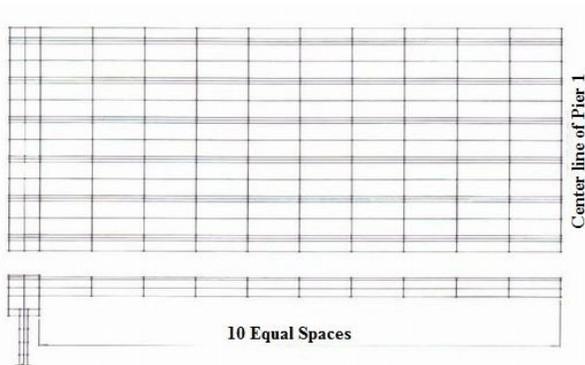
Plan and elevation view of the mesh layout of the first span of the model
